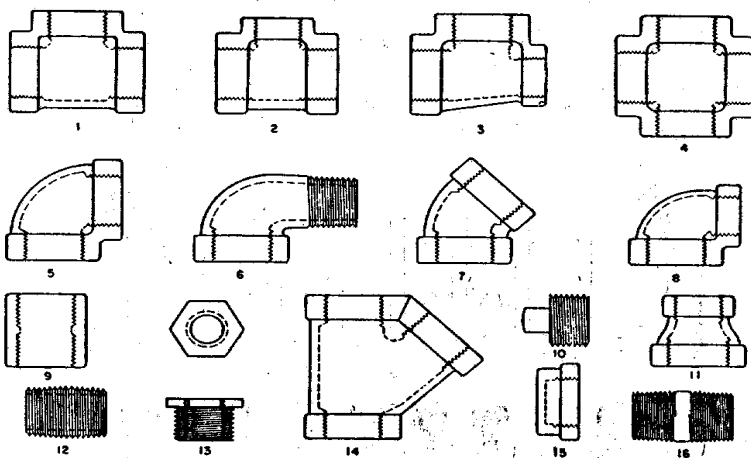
Screwed pipe fittings: (1) tee; (2) tee reducing on outlet; (3) tee reducing on run; (4) cross; (5) elbow; (6) street elbow; (7) 45° elbow; (8) reducing elbow; (9) coupling; (10) plug; (11) reducer; (12) close nipple; (13) bushing; (14) Y branch; (15) cap; (16) short nipple.
